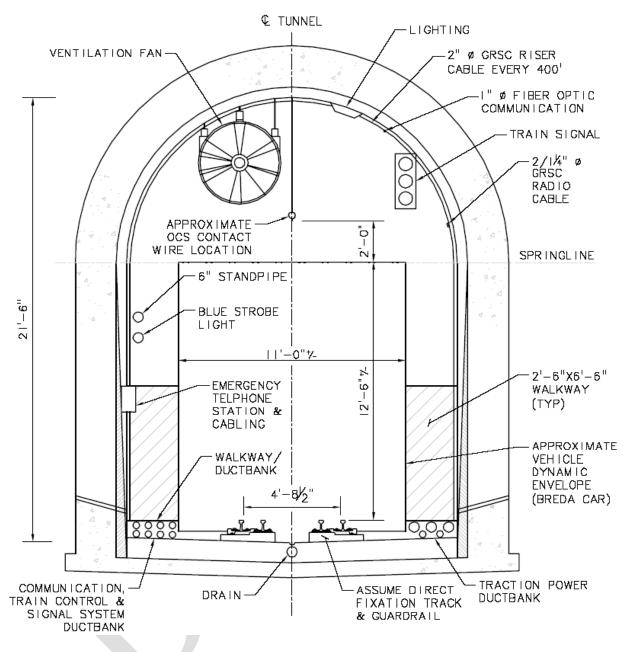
Fort Mason Tunnel with direct fixation track
